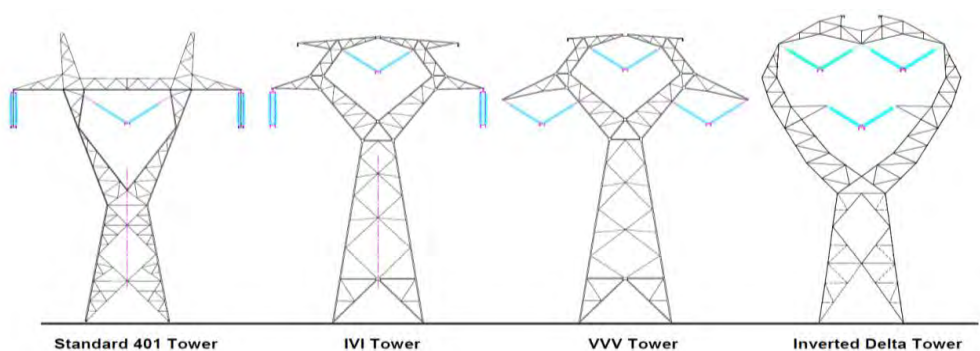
Outline Drawings of Lattice Steel Towers (not to scale)
